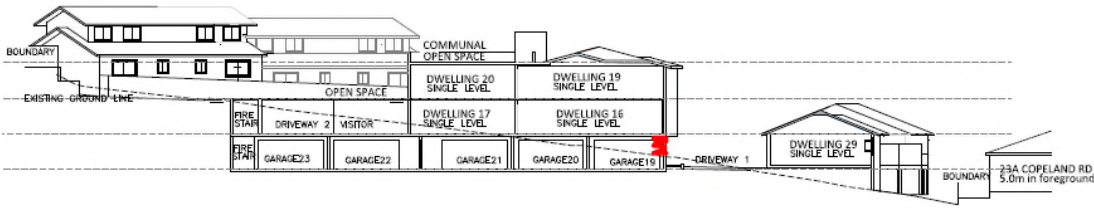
Section, prepared by Peter Brooks, 03/11/22
